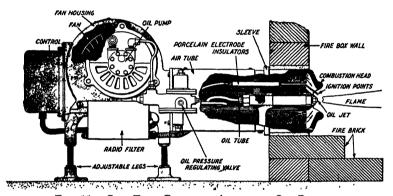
Gun Type Pressure Atomizing Oil Burner
